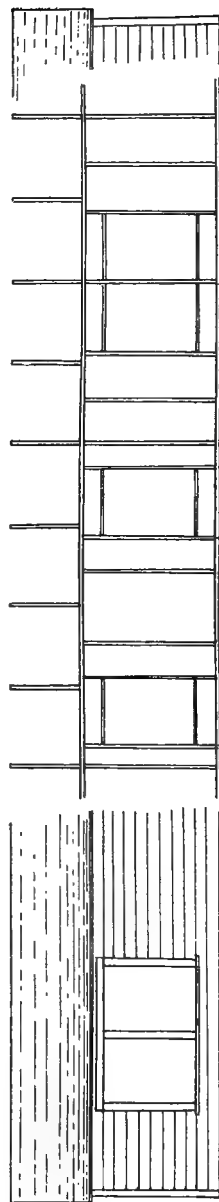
Front elevation and frame of Fig. 146. Elevation of *A*; frame of *B* and *C
